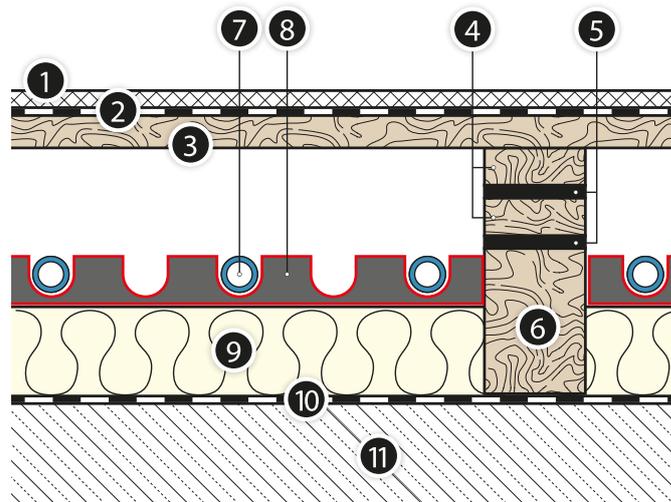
Cross-section of the floor with surface elasticity, with a floor heating installation made of KAN-therm Rail System elements.
